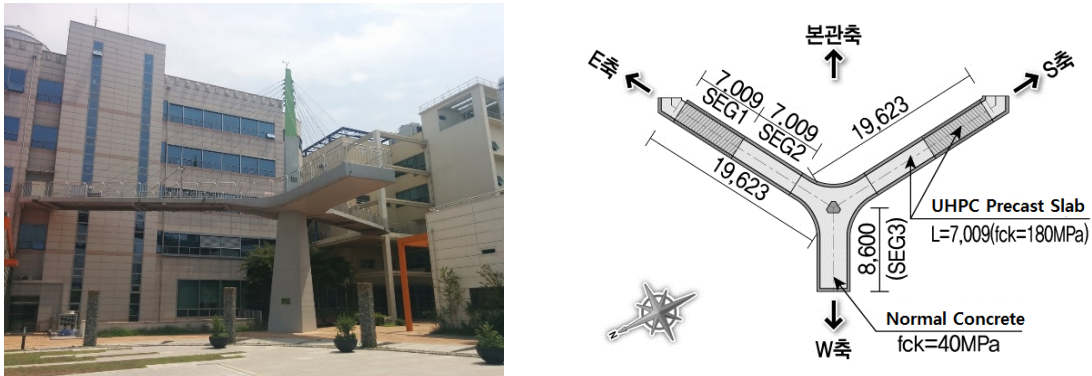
UHPC Pedestrian Cable Stayed Bridge Built at KICT
